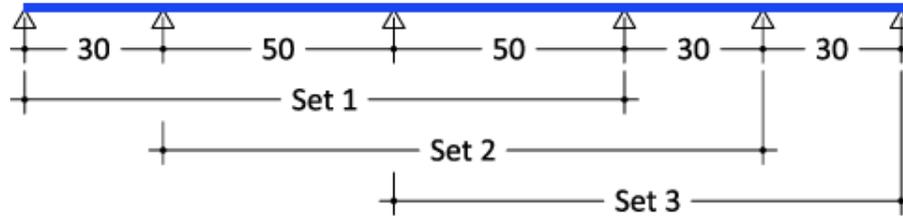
5-Span Continuous Bridges – Span Set Configurations
